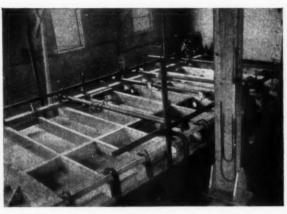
Rig for static loading tests. (Floor section is inverted, with captive airbag beneath for loading.)
